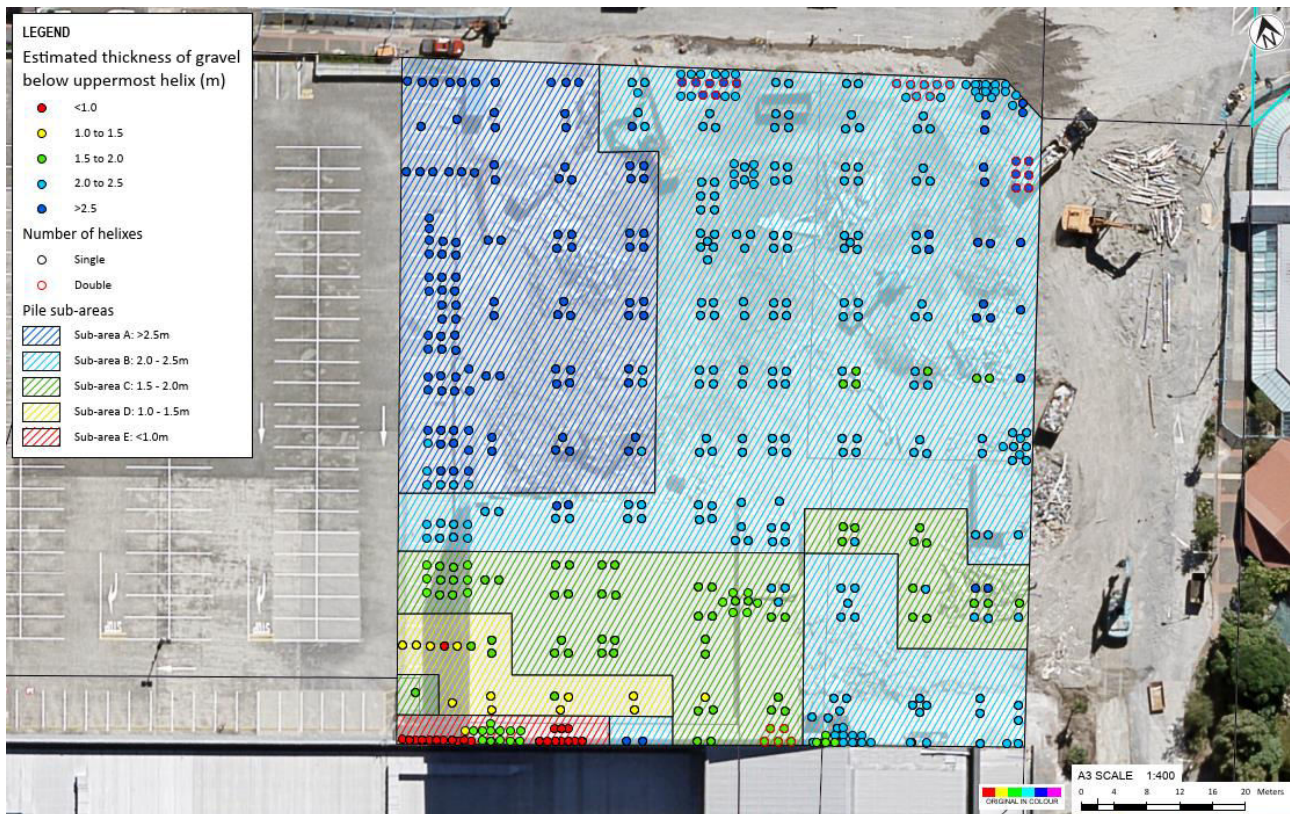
Thickness of gravel beneath the screw pile helices and pile foundation sub-areas used in design.
